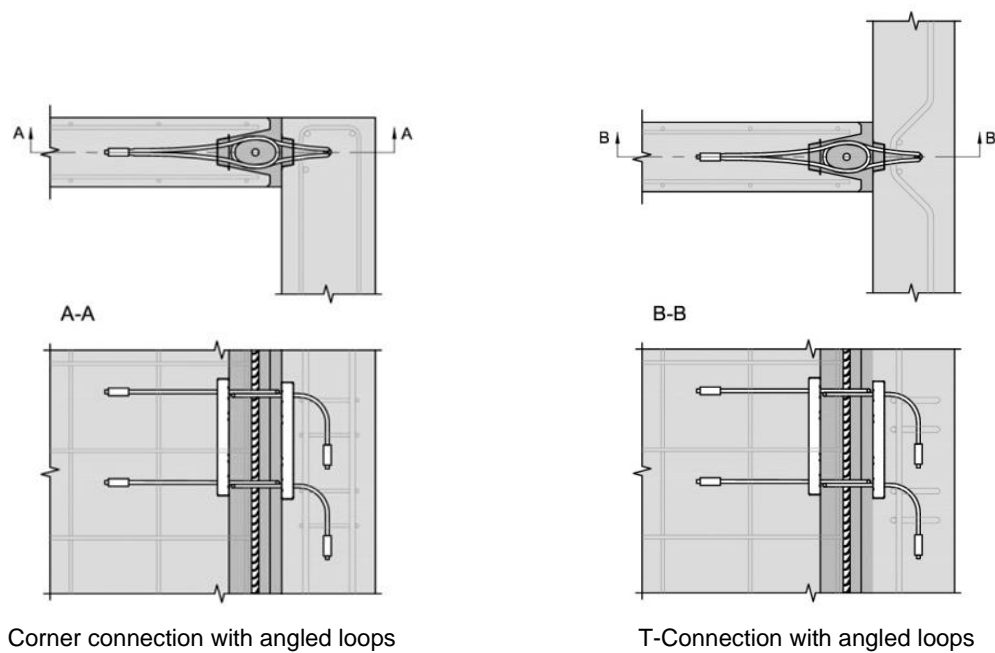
Example of a wire loop system embedded in two concrete members (connection of two precast concrete elements)
